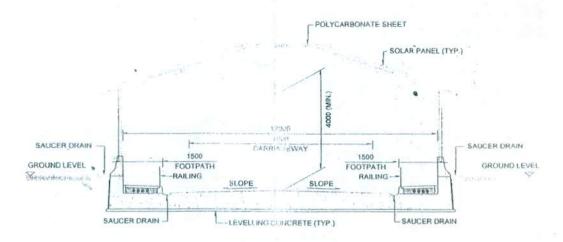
Typical Cross Section for Approach Start (Type-1)
